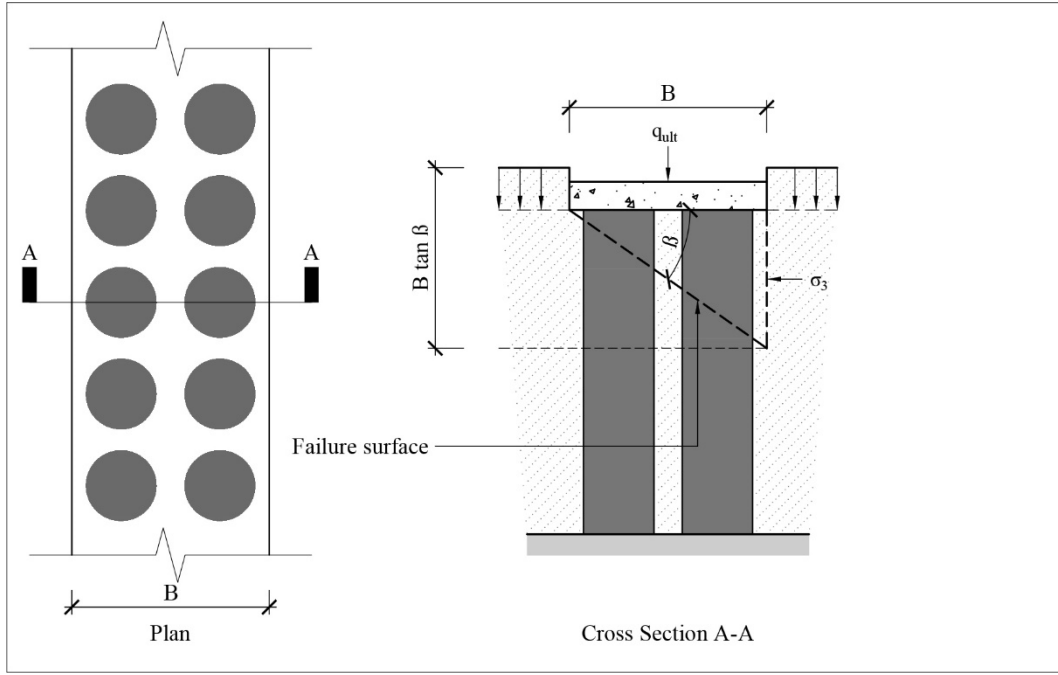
The assumed rupture surface during failure of a soil supporting an infinitely long foundation on several granular columns (adapted from Barksdale & Bachus, 1983)
